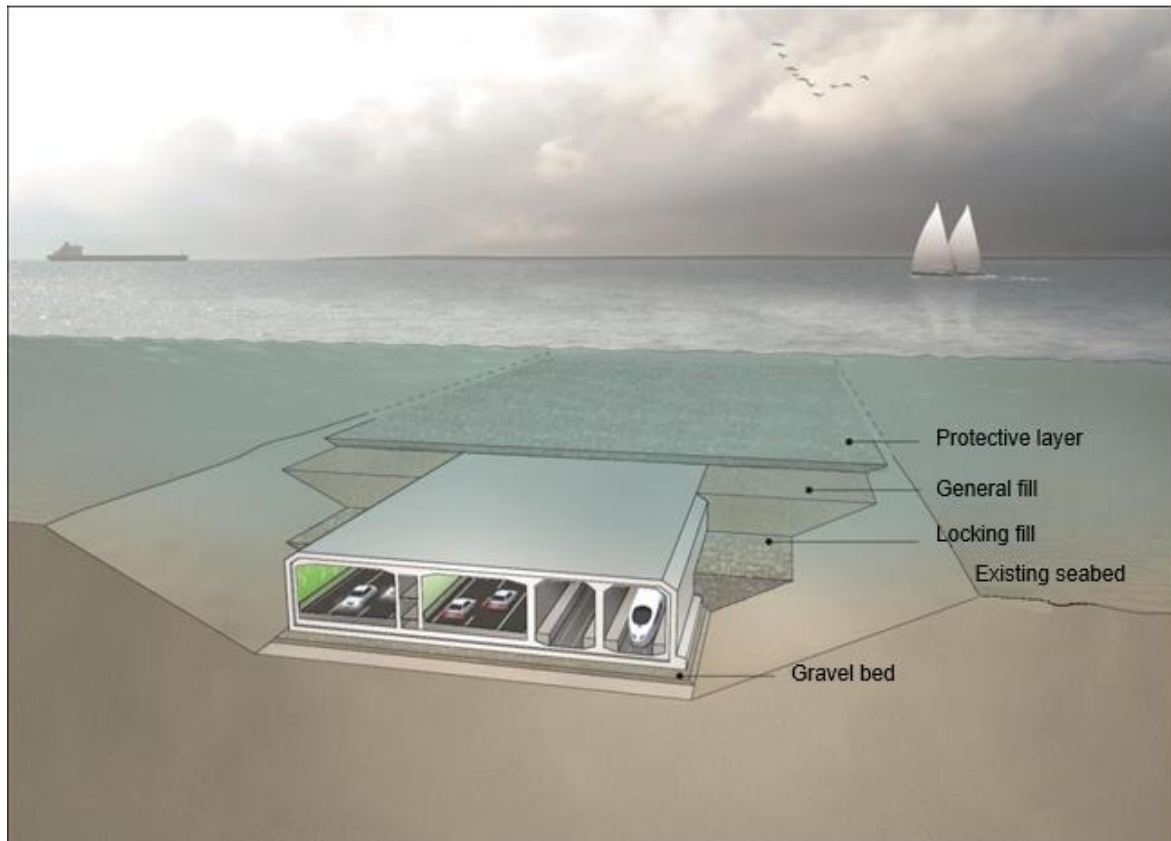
Perspective view of the immersed tunnel trench with tunnel element and fill
